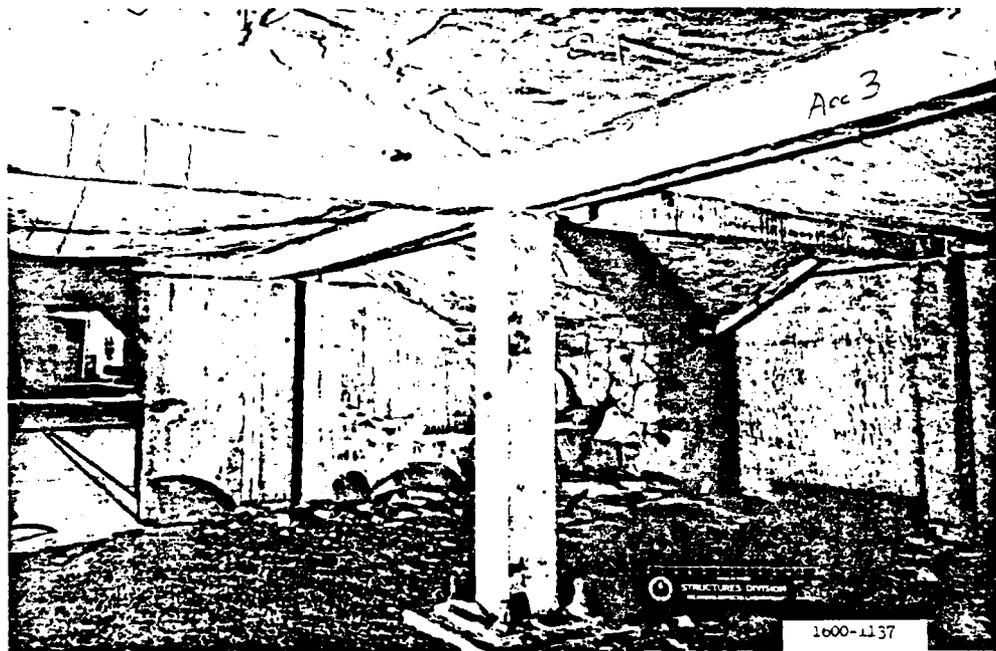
Posttest View of Southwest Column and Framing Beams; Dynamic Model. (Ref. 43)
